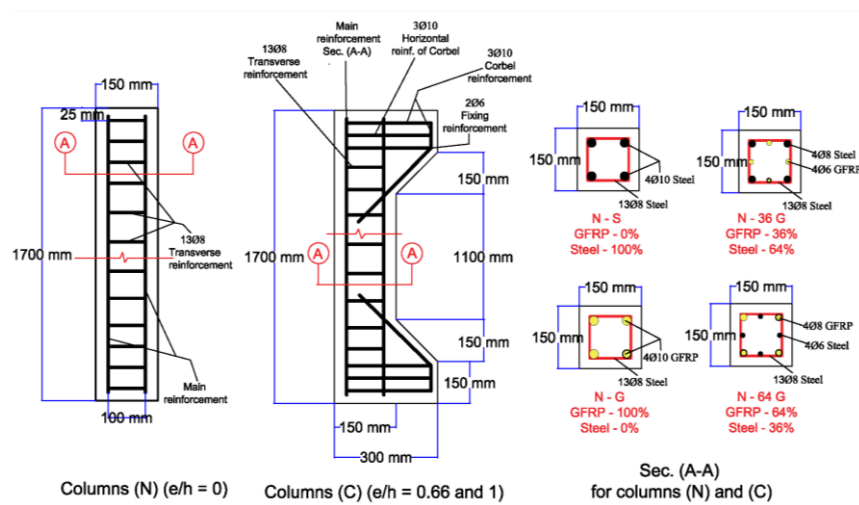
Dimension and reinforcement details of R.C. columns (N) and (C)
